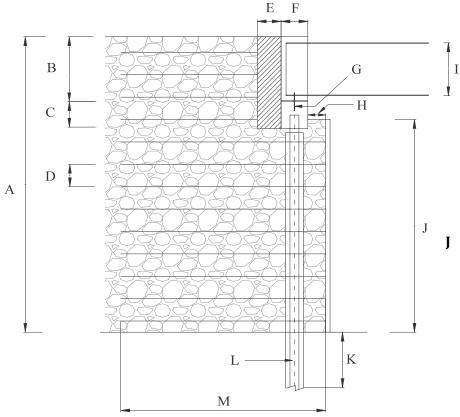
Integral Bridge Abutment cross section. Abutment B672 - A.
